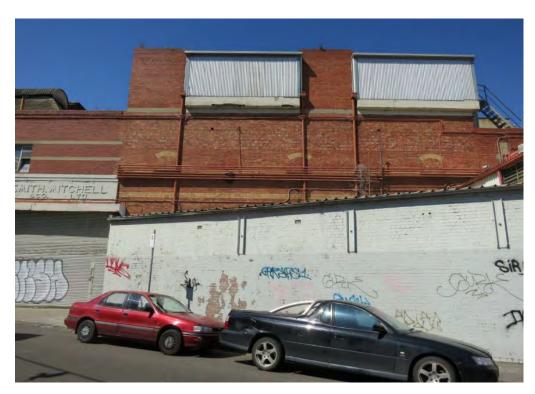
B5, north elevation to Gough Street; powder coated aluminium louvred screens will replace the corrugated steel panels to the north roof elevation; the painted wall to the 1918/19 north addition, in the foreground, will be retained but modified with new openings, and the paint removed
